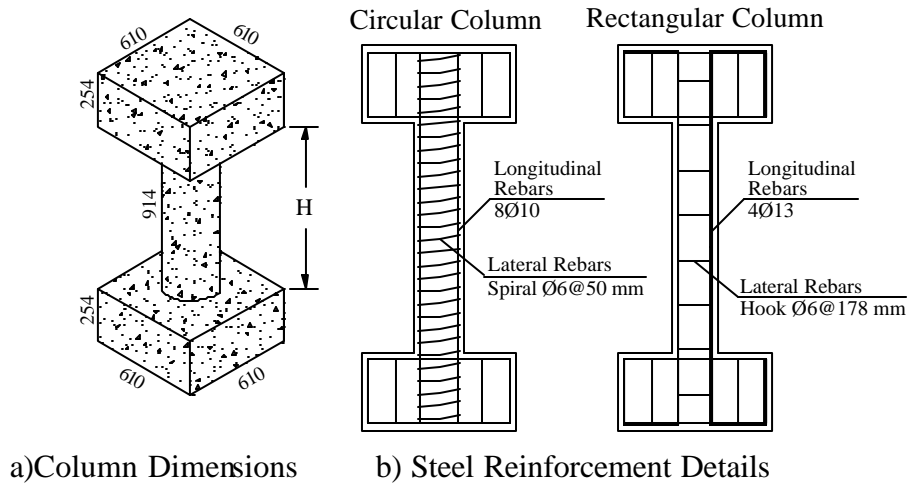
Dimensions (mm) and Steel Reinforcement Details
